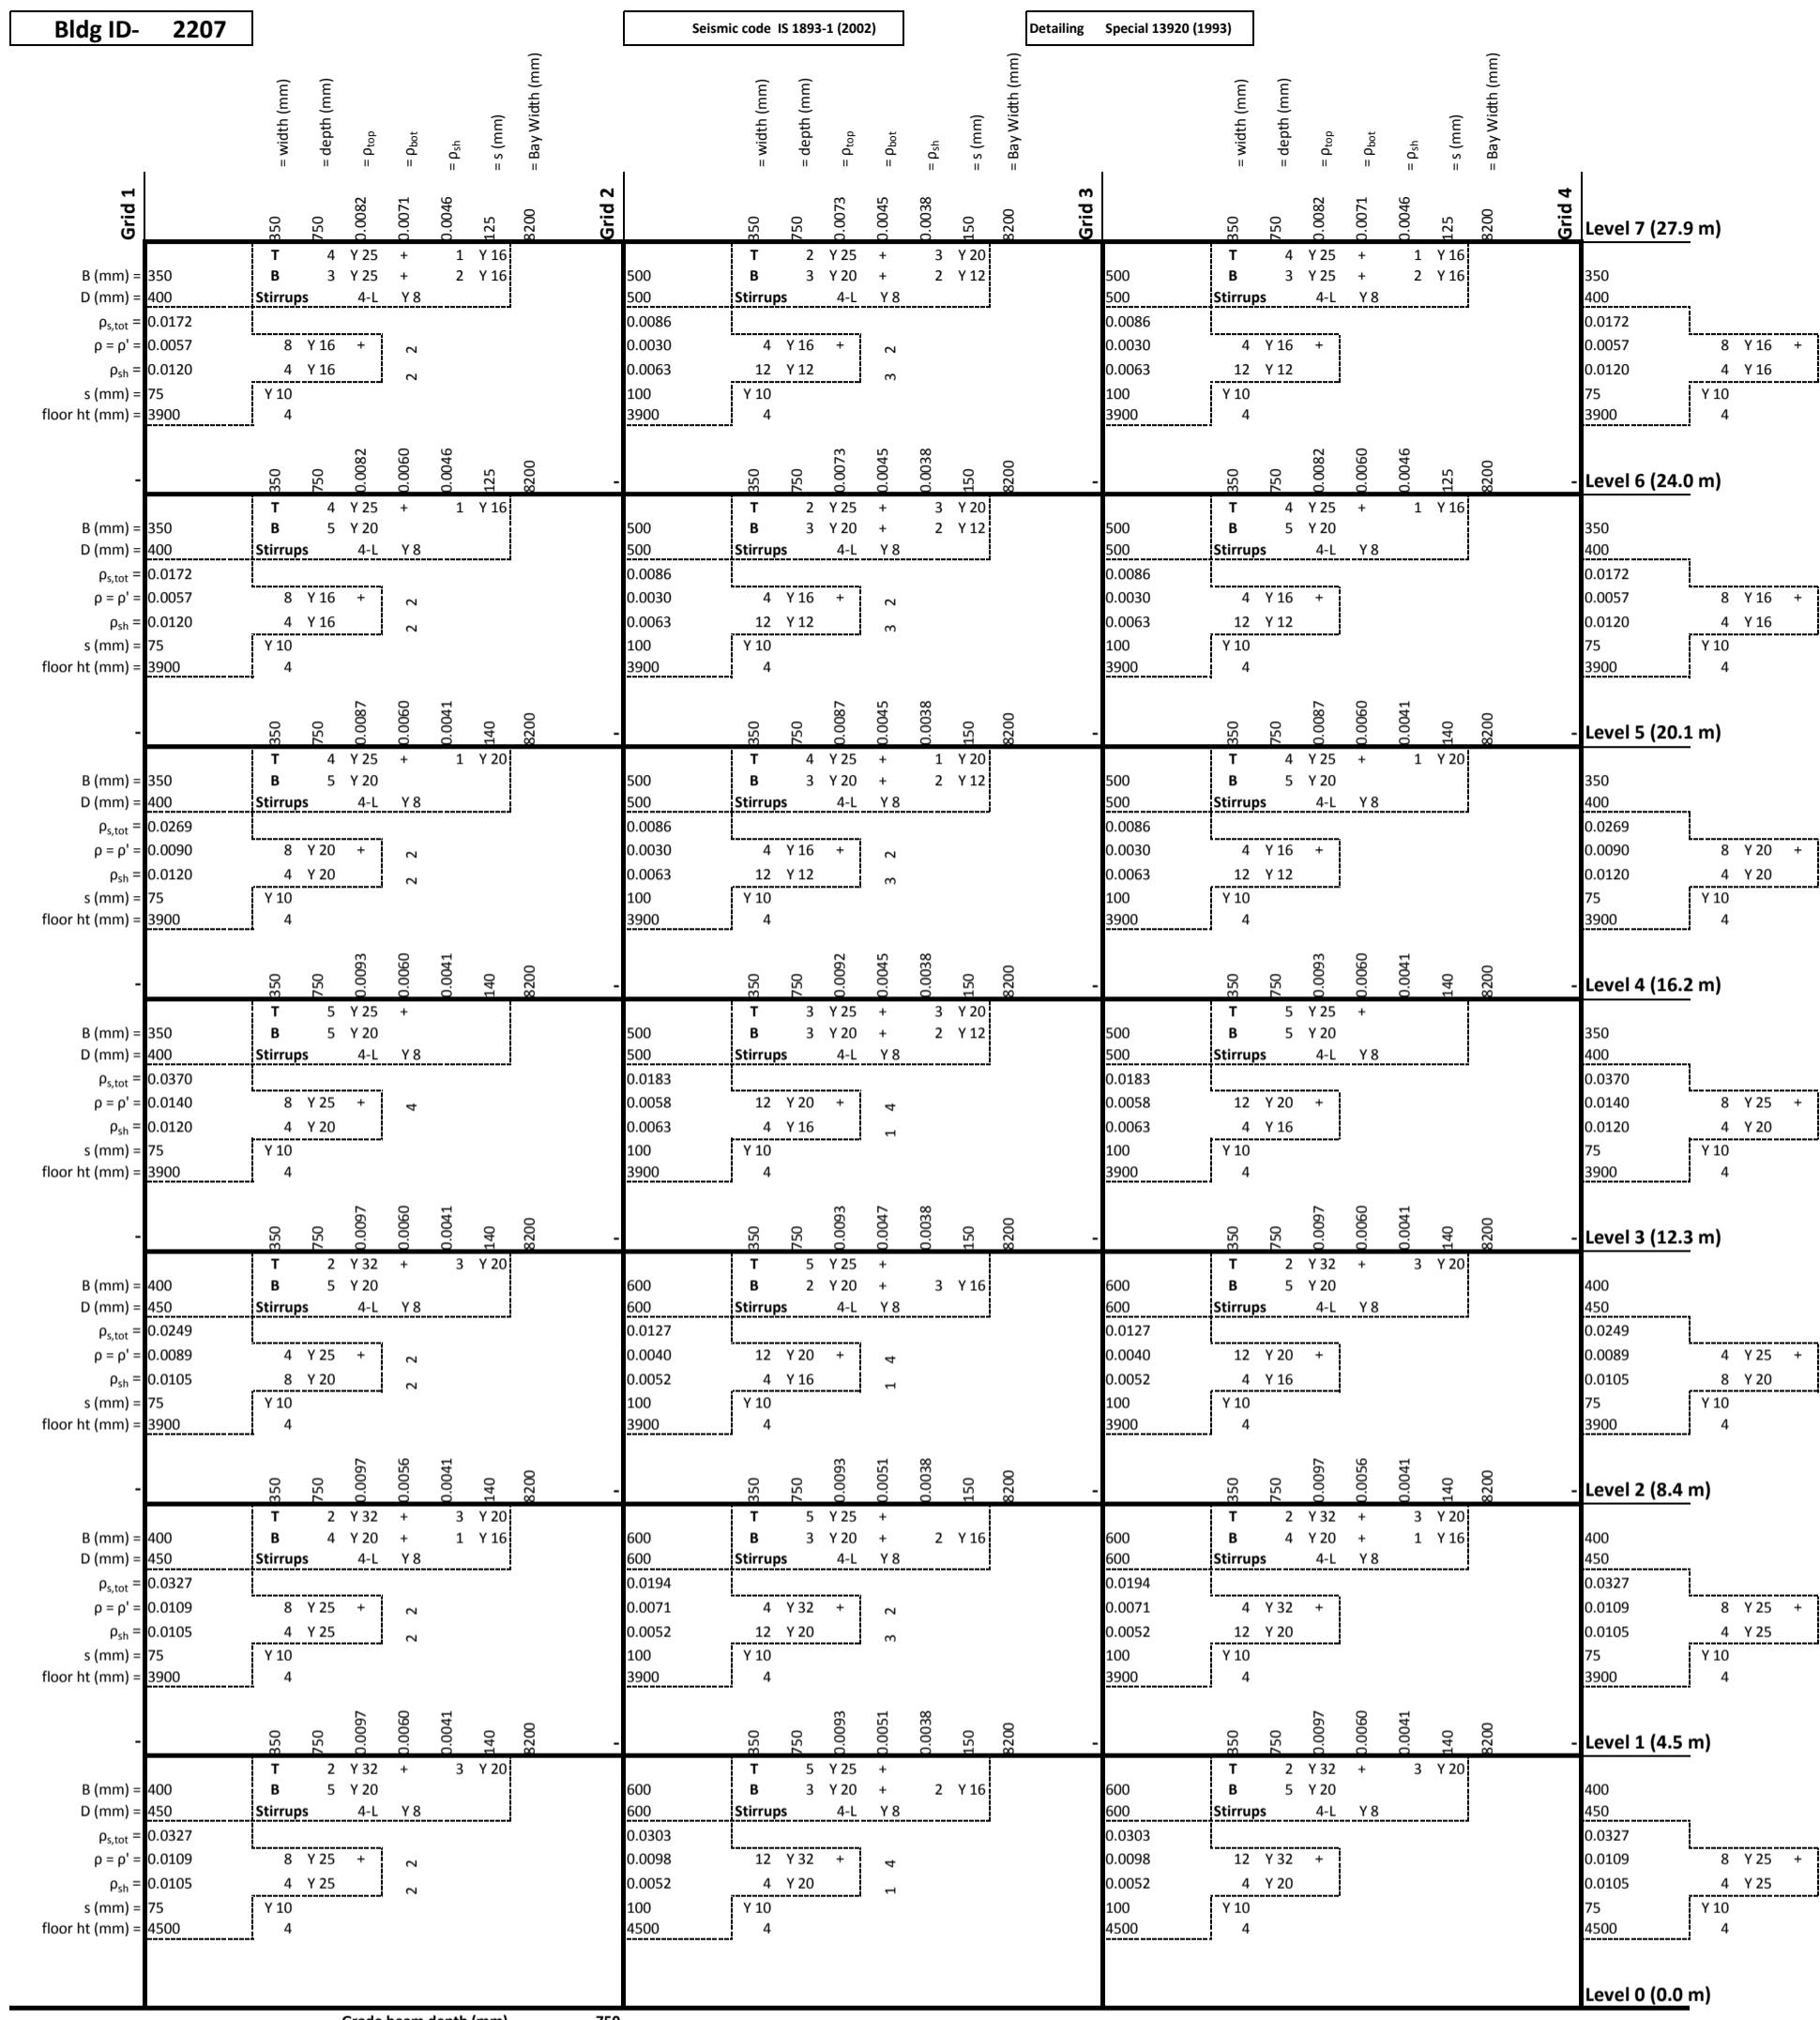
Provided reinforcement and modeling details for building ID 2207
